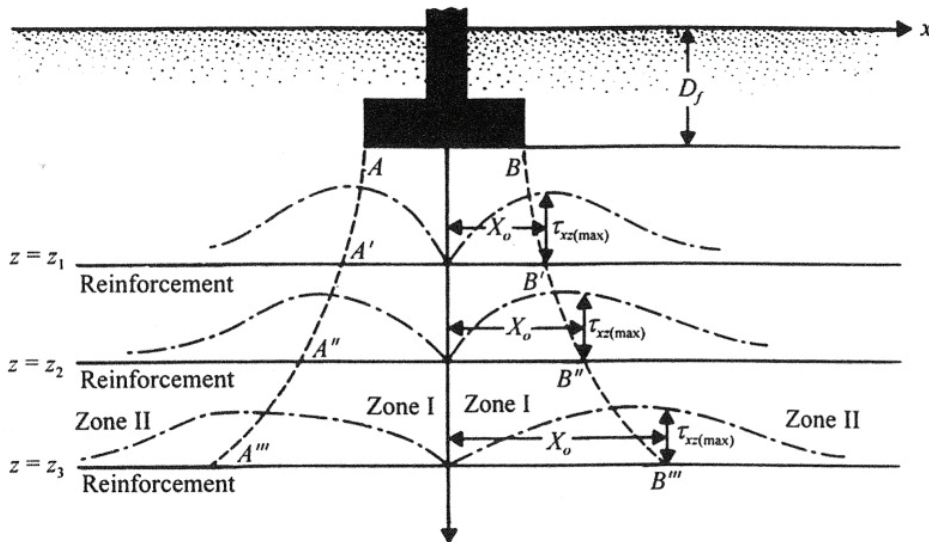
Failure mechanism under a strip foundation supported by reinforced earth based on Binquet and Lee (1975b)
